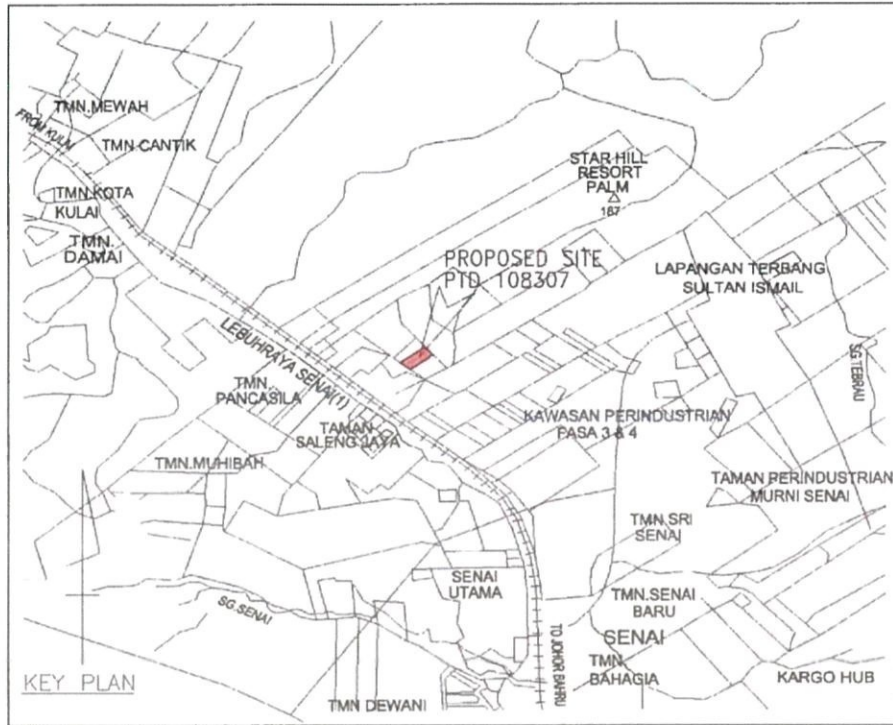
Key Plan (source: Yeo Plumber Sdn Bhd Shop Drawing)
